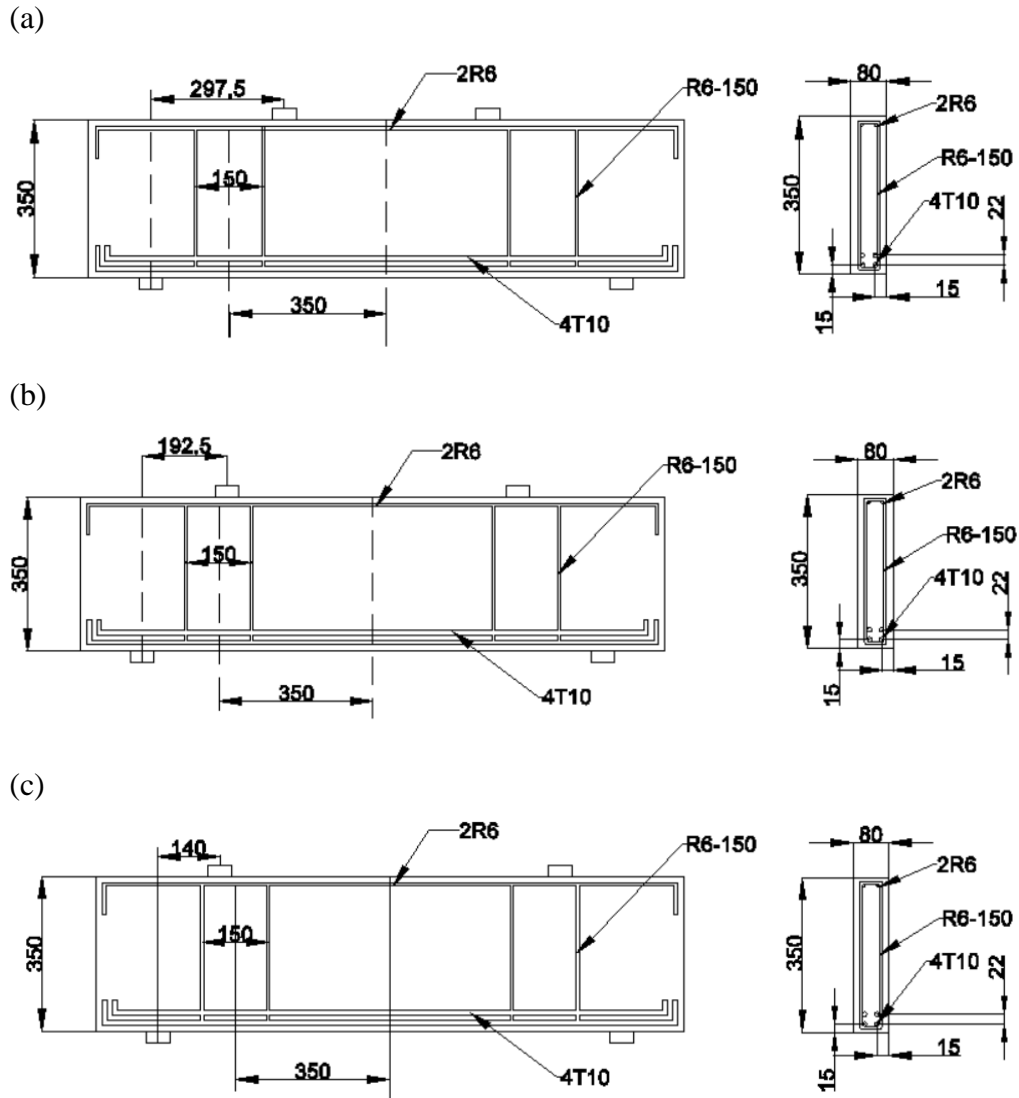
Detailing for Test Beams for Batch 1: Shear Span to Depth Ratio
